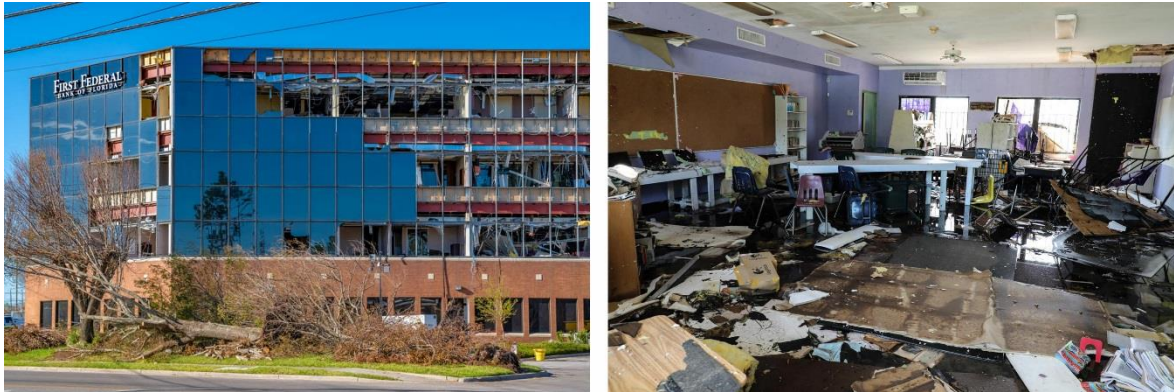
Flying debris damages on a building façade and view of a floorplan damaged by the combined action of rain and wind.
